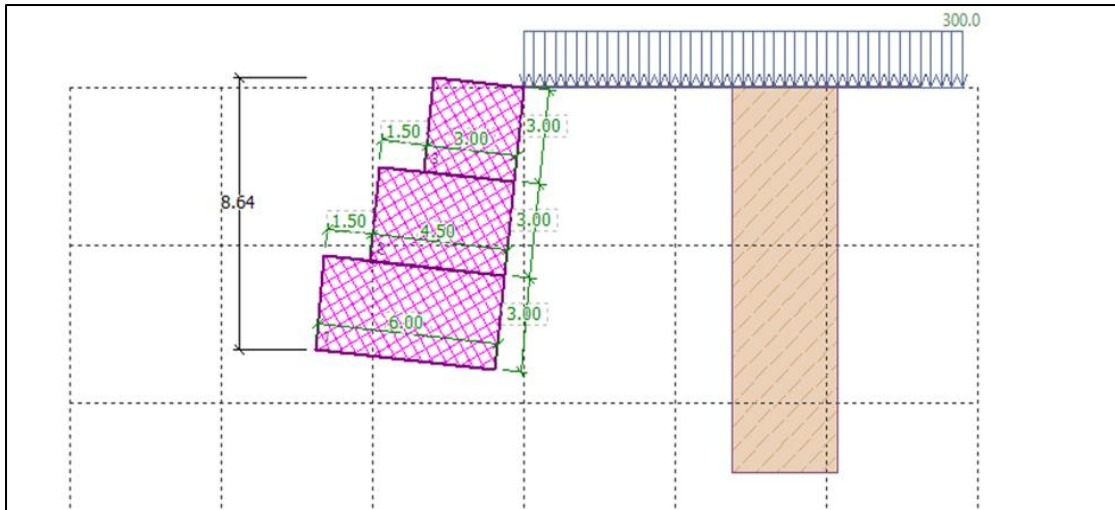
X-section view of Gabion Retaining wall from GEO-5
